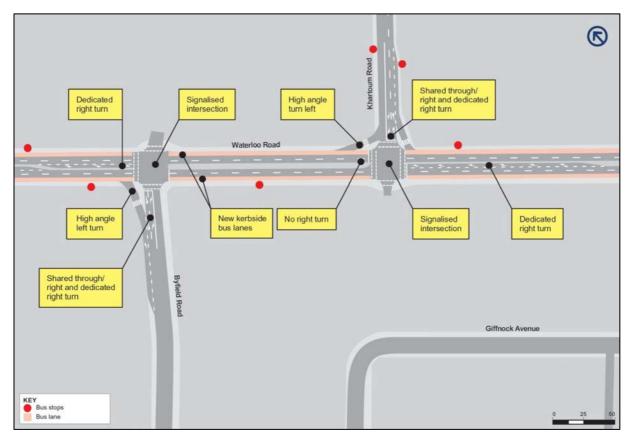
Proposed changes at the intersections of Waterfloo Road with Byfield Road and Khartoum Road
